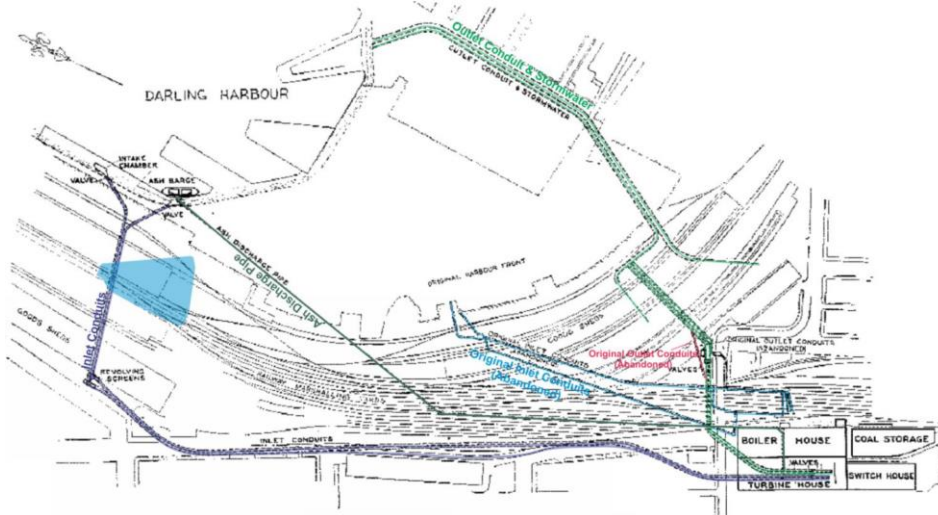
Plan showing the shoreline in relation to circulating water tunnels and conduits inlet and outlet used in 1899 and those constructed in the mid-1920s.
